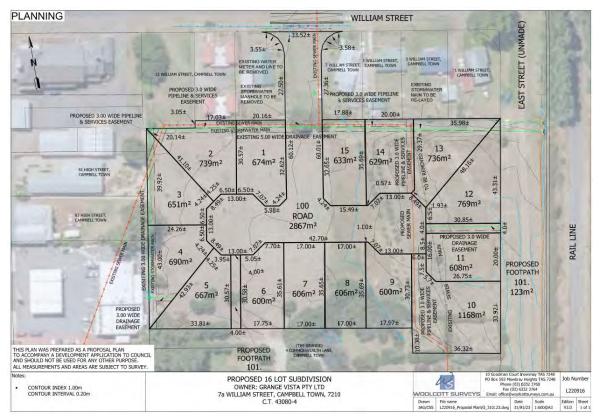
Proposed residential subdivision (ref. Woolcott Surveys L220916 Proposal Plan 310123 V3)
